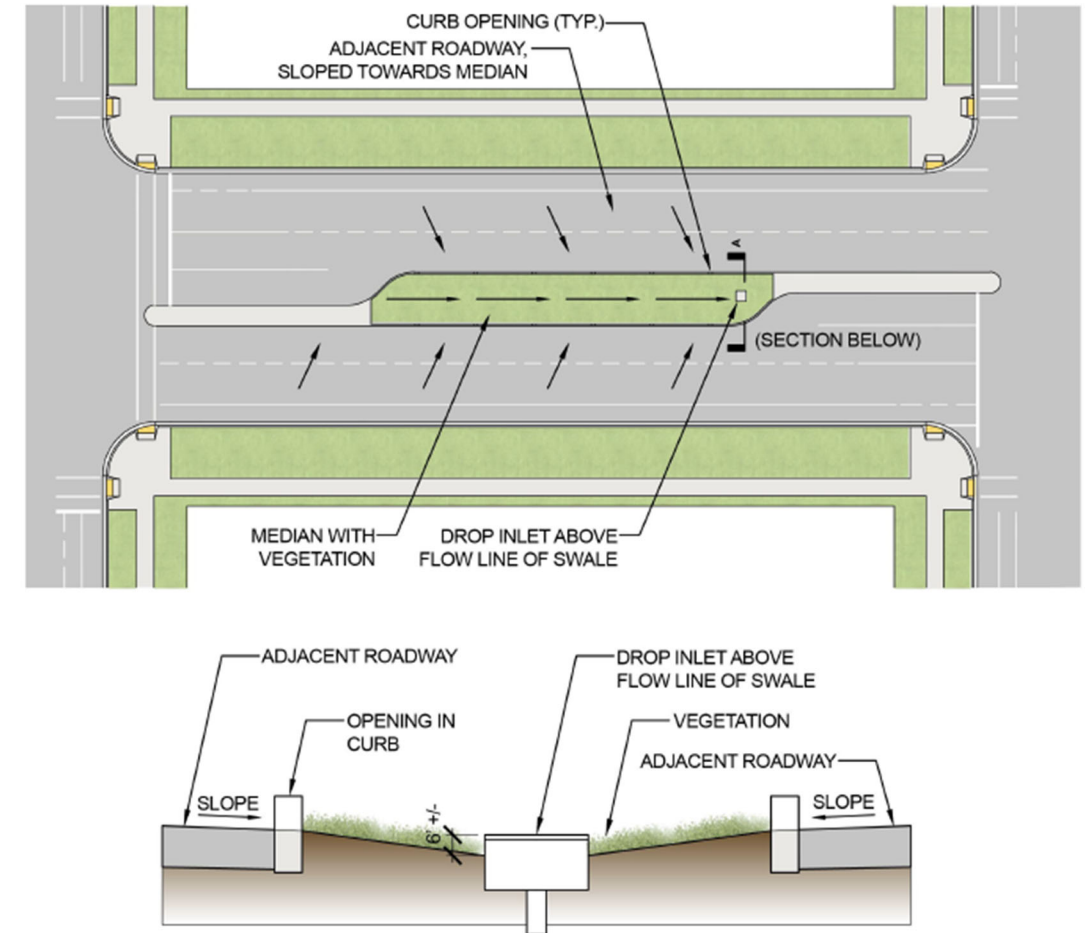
CONCAVE MEDIAN PLAN AND SECTION VIEWS
